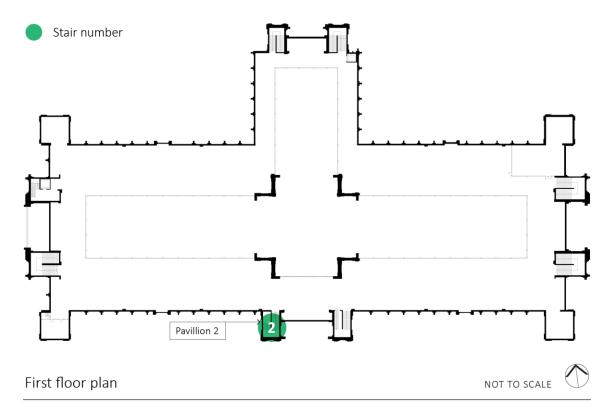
First Floor Level Plan indicating the location of the works effected area.
